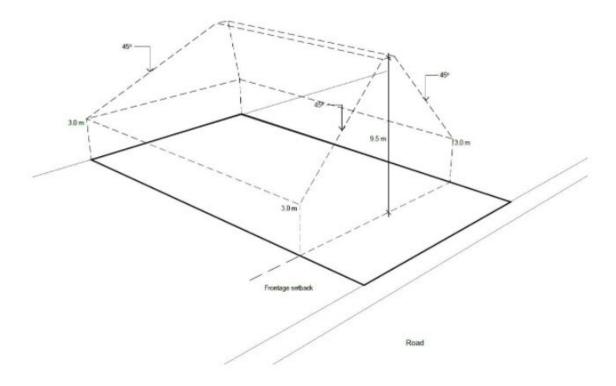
Building envelope for corner lots as required by clause F5.6.2 A3(a) and clause F5.7.1 A2(a)
